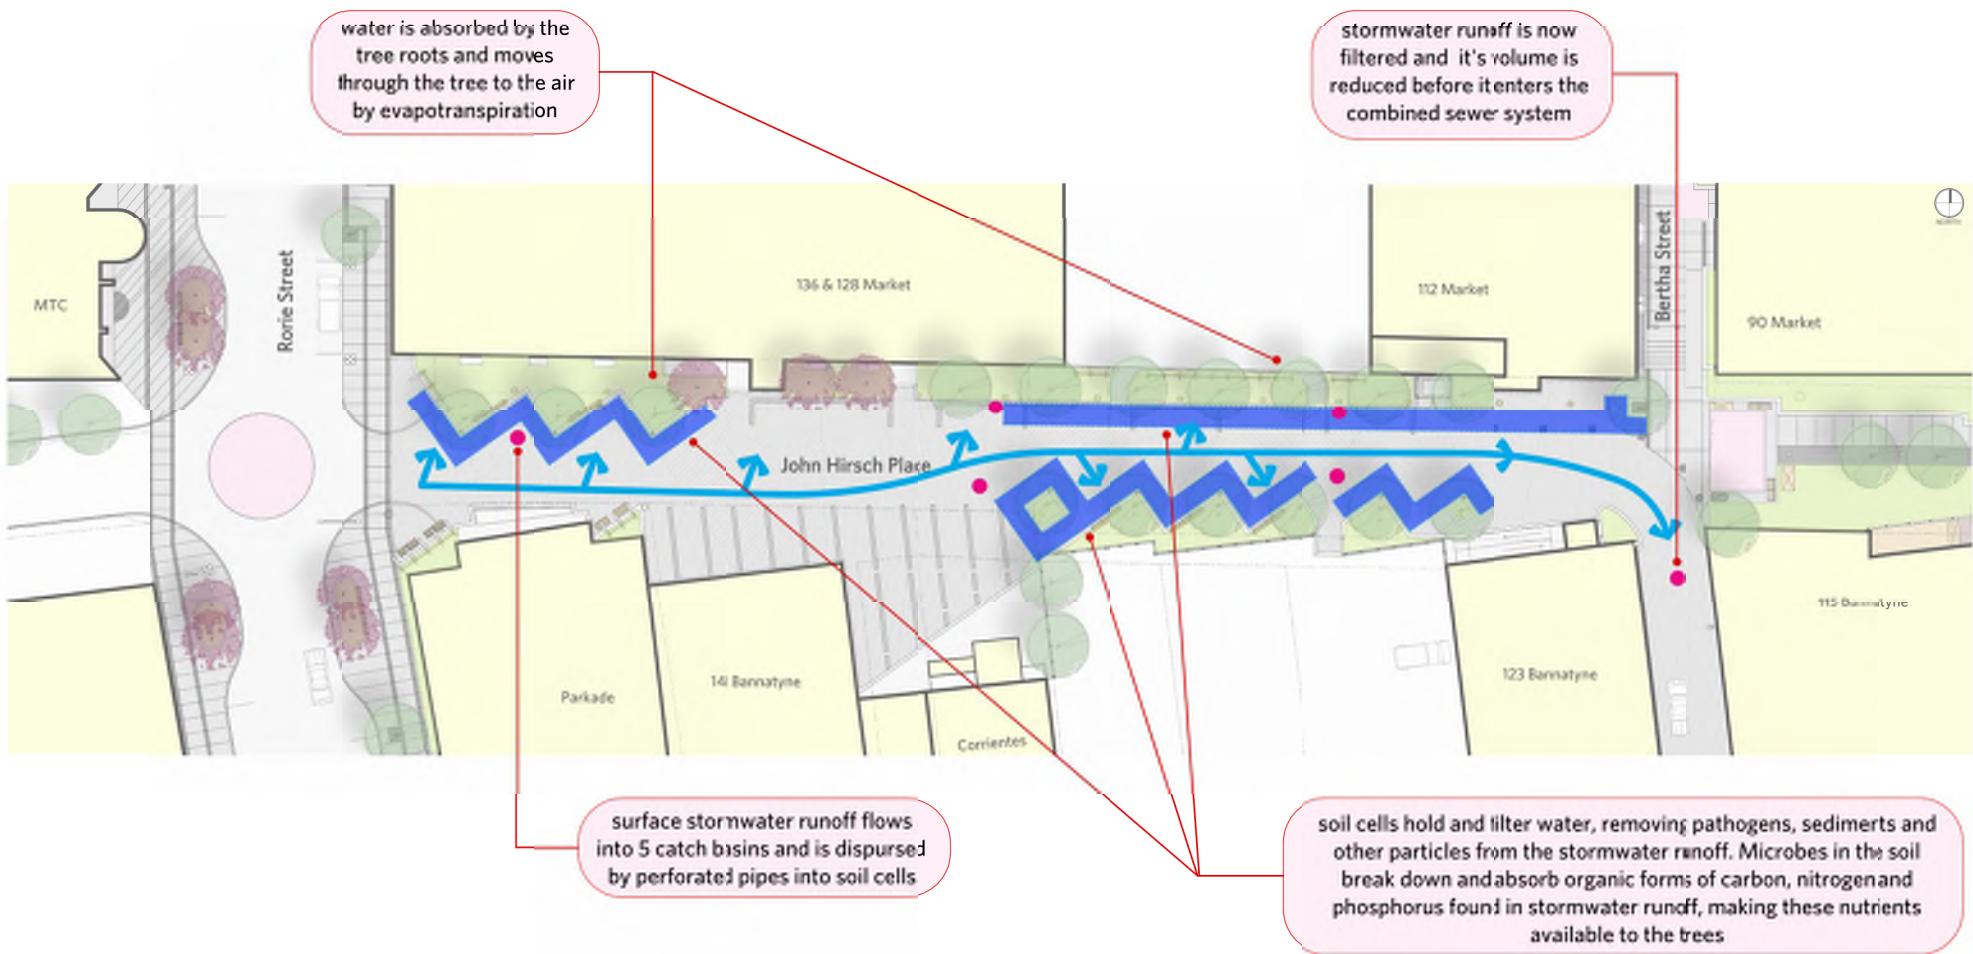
John Hirsch Place Sustainable Drainage Plan
